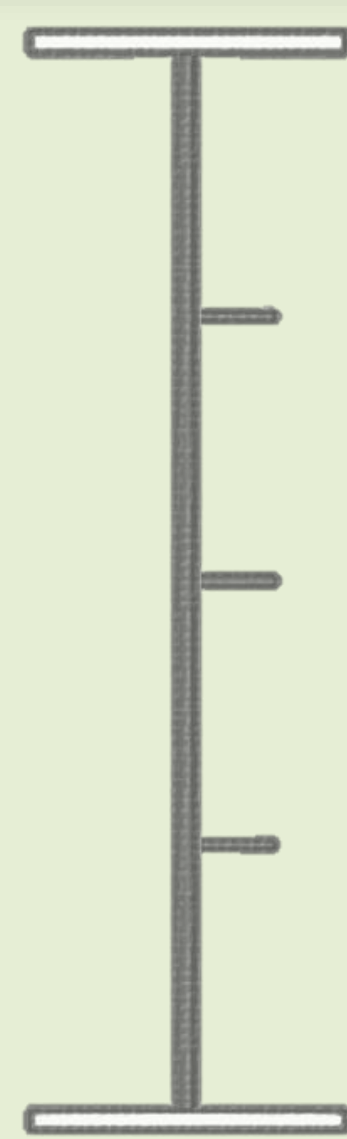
Girder with three weak open-section longitudinal stiffeners
